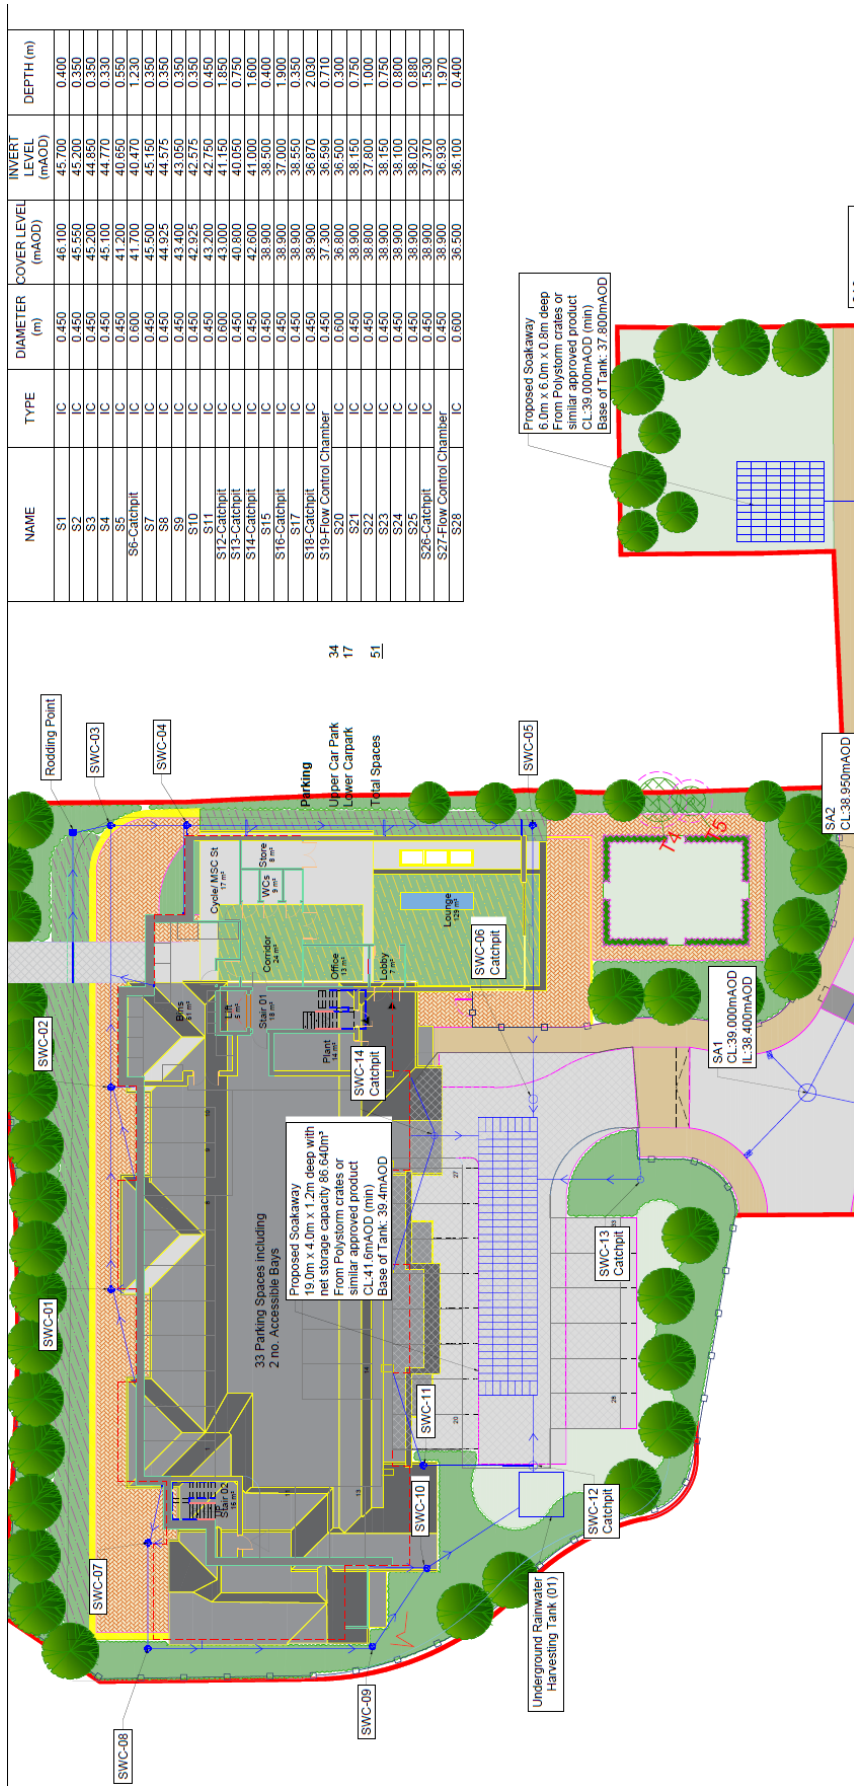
Extract 1 of 2 - SuDS & Surface water drainage layout plan Block A
